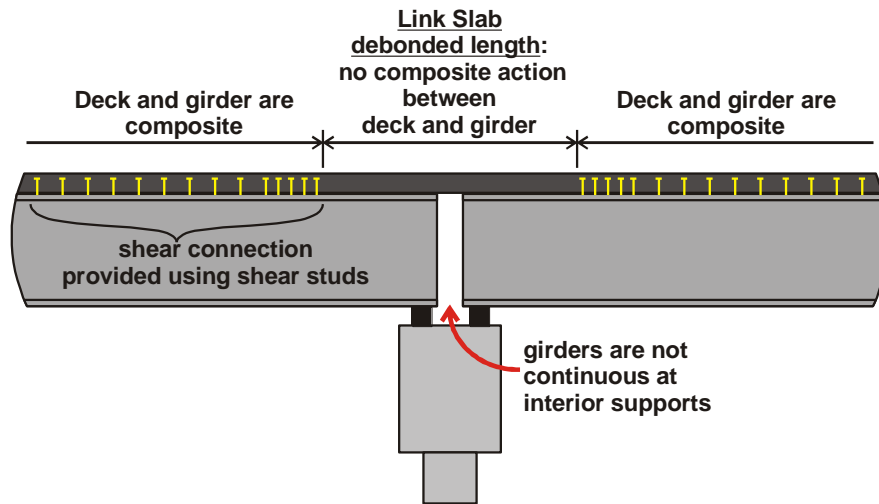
Link slab configuration at the bridge pier (Courtesy of Dr. J. S. West from The University of Waterloo)
